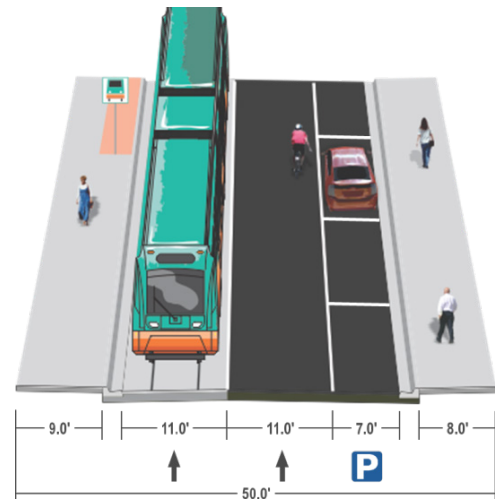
NE/NW 2ND STREET – LEFT LANE/INSIDE LANE TYPICAL SECTION (OLA)
